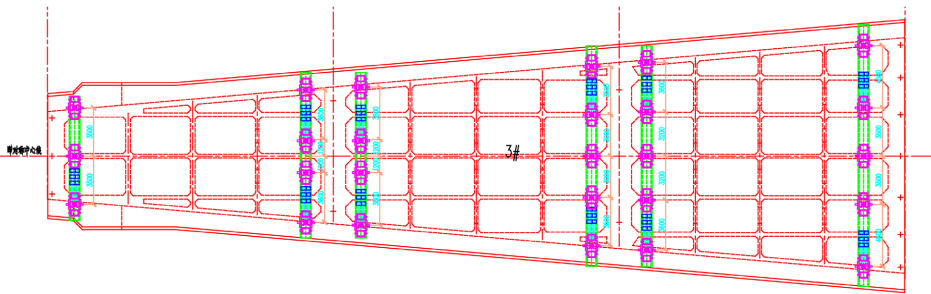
Layout of the rail clamping equipment for the exiting beam No. 3
